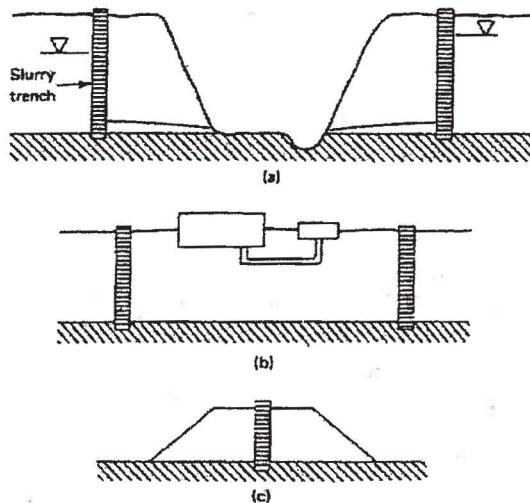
Slurry trench applications. (a) Construction dewatering. (b) Containment of groundwater pollution. (c) Sealing of dikes and dams.
